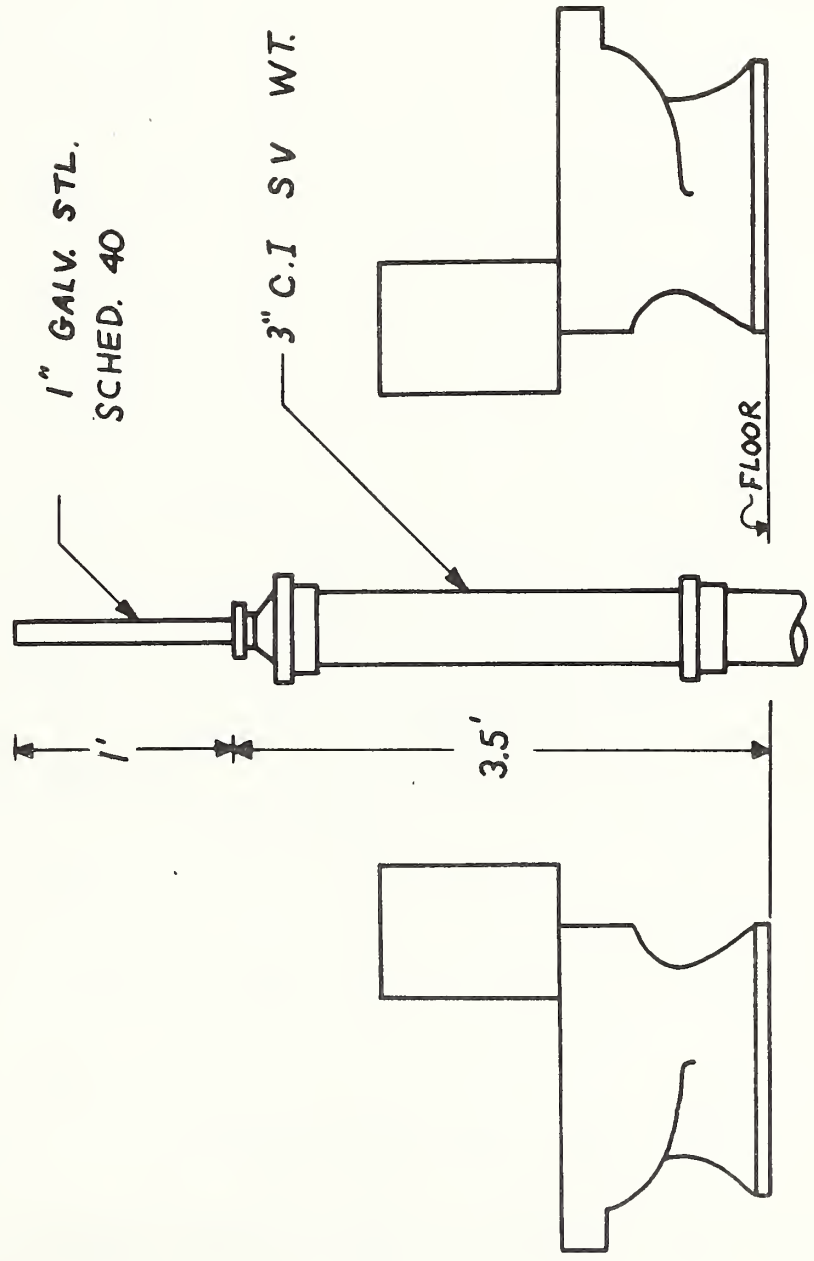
Test installation details for main vent using a 1-ft. length of 1-in. steel pipe.
